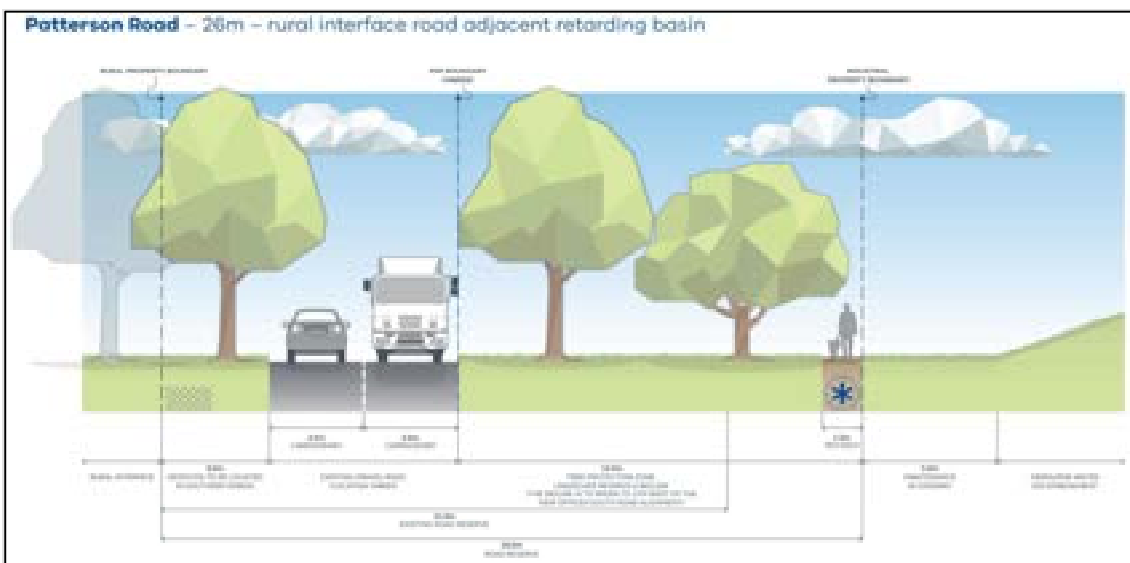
Rural interface road (with retarding basin) – Patterson Road
